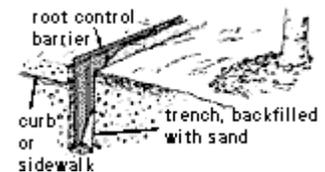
A vertical underground barrier will help keep tree roots from damaging concrete as they grow.
